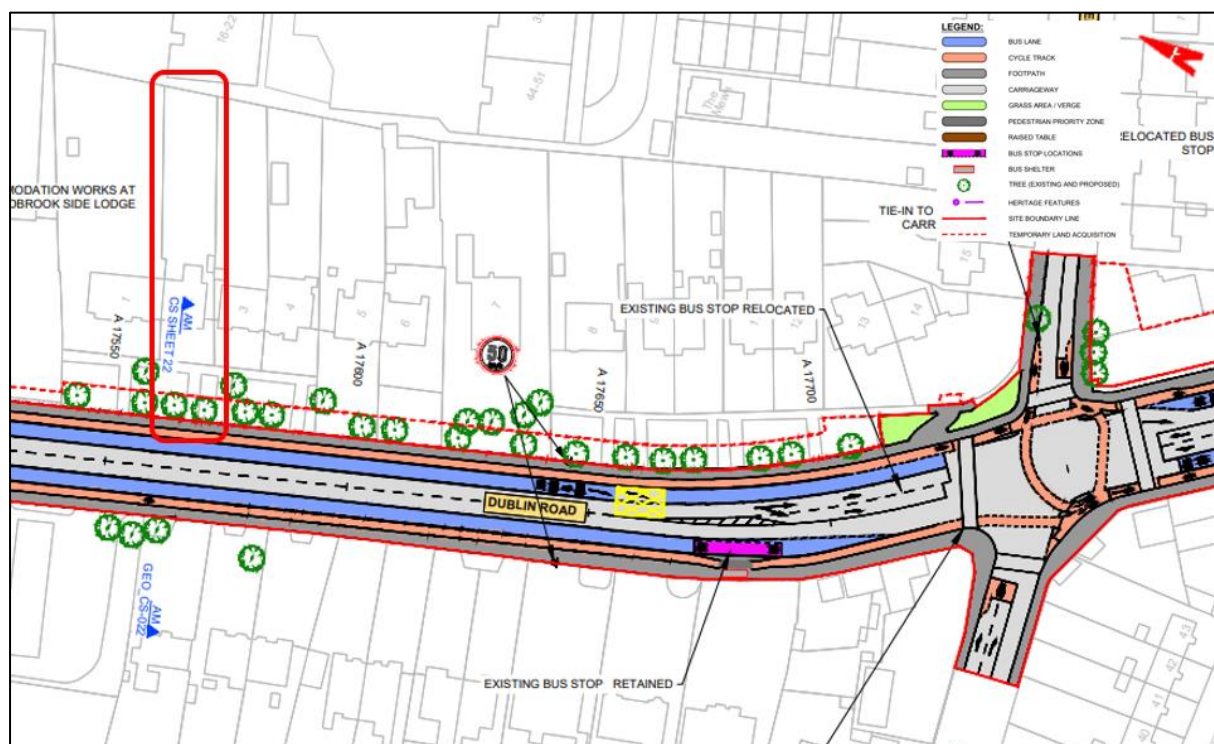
Extract from General Arrangement Drawing at Dublin Road (Sheet 50)
